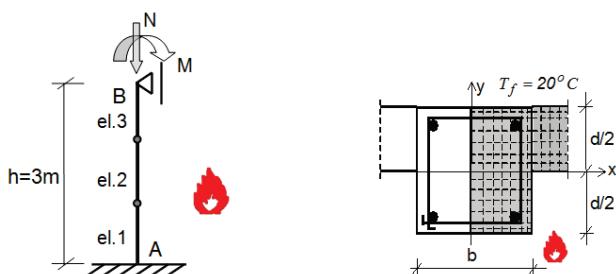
Eccentrically loaded RC column as a part of a wall that separates the fire compartment: geometry and support conditions, cross section geometry
